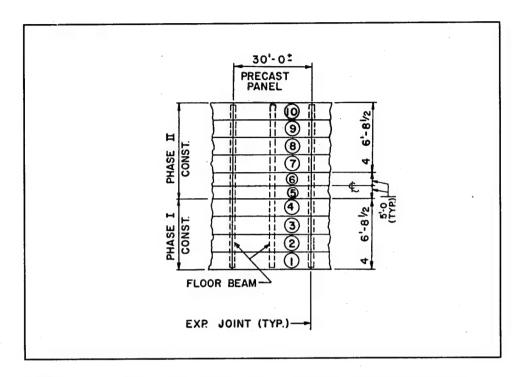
Layout of deck section with 10 precast slabs posttensioned transversely, Fremont Street Bridge (from Smyers 1984)
